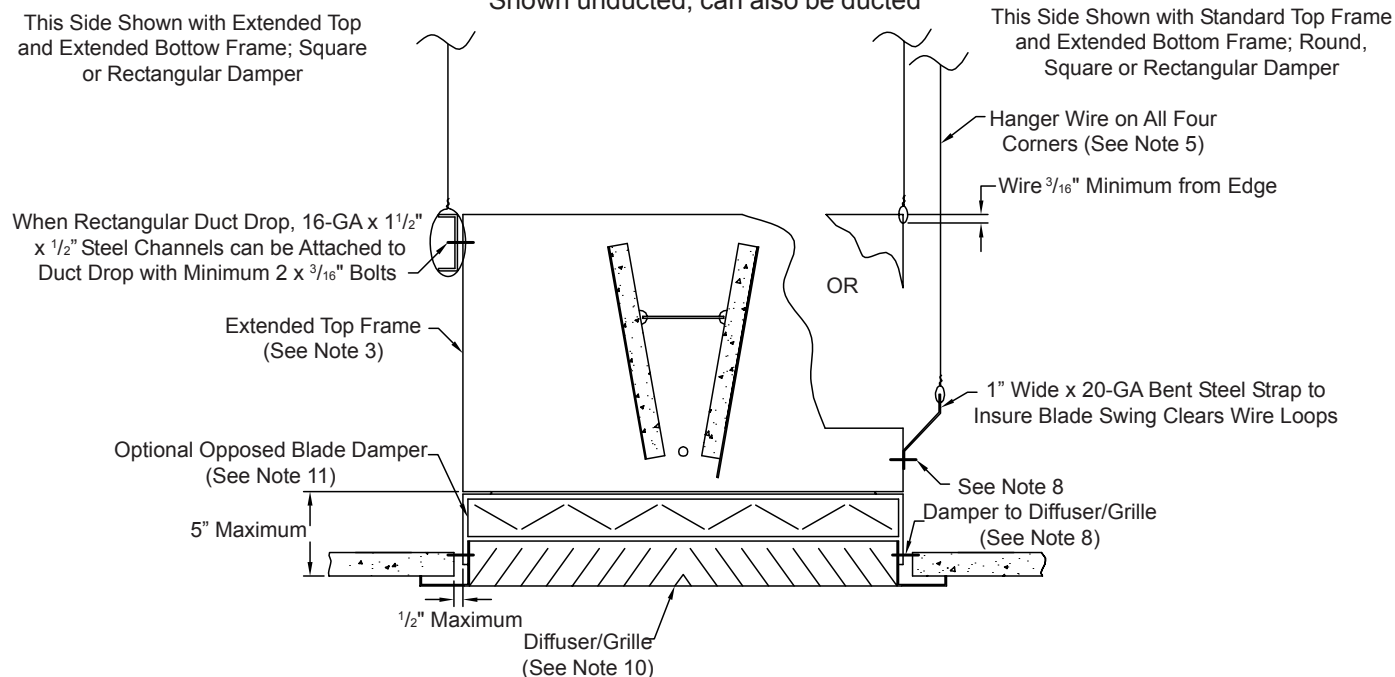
Ceiling Damper that Fills Ceiling OpeningFigure 4 - Ceiling Damper on Neck of Diffuser
